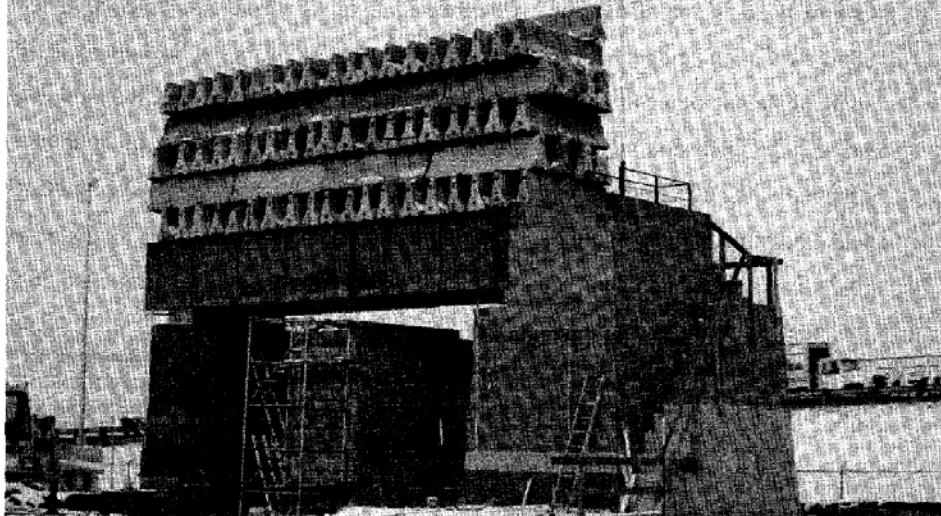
CDOT GRS Piers and Abutment Test Setup Wu, J. T. H., Ketchart, K., and Adams, M. (2001). "GRS Bridge Piers and Abutments." *FHWA-RD-00-38*, Federal Highway Administration, McLean, VA. Used under fair use, 2014.
